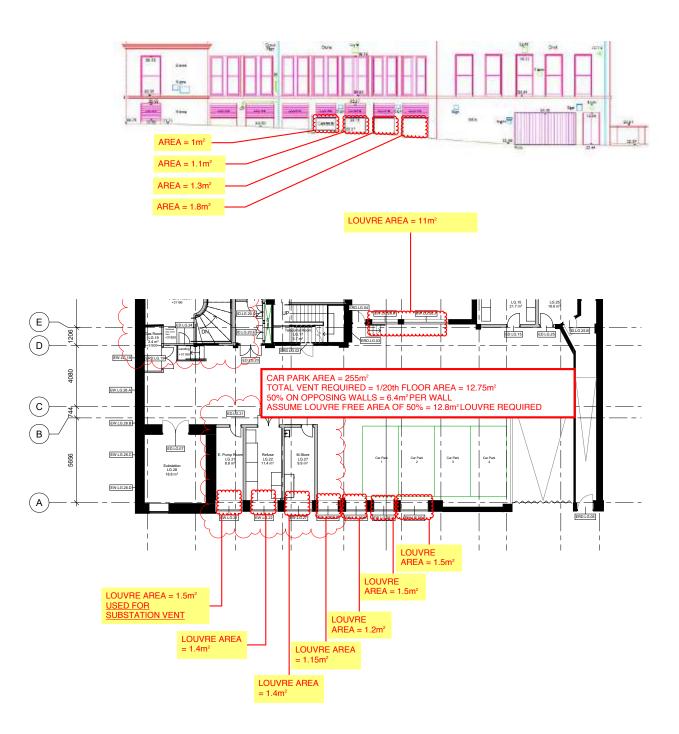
shows the location of this as viewed from Wellington Street. The additional louvres are designed to sit within the existing pilasters, with the existing openings cut down to provide the additional ventilation space required. The client is proposing to paint these louvres to match the colour of the surrounding stone, as has been done with those that are existing in order to reduce their visual impact.
